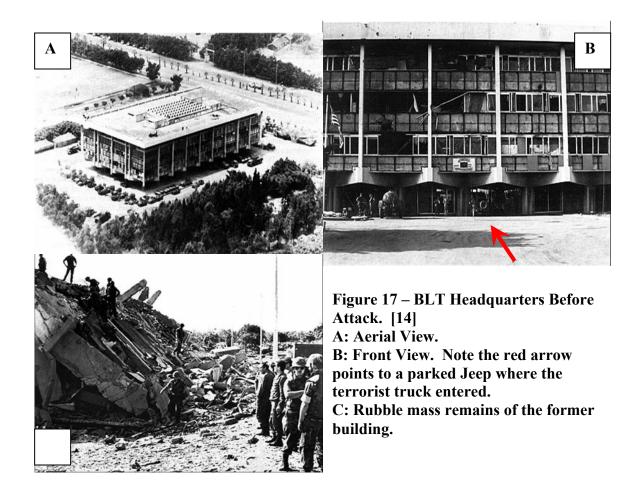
shows the headquarters building of the BLT before the attack and after the attack. The building is a four story reinforced concrete building located in the administrative area of the Beirut International Airport. The building had suffered fire and explosive attacks before the BLT occupied it. Most of the plate glass had been replaced with plywood, and the interior elevator was inoperable due to fire damage, otherwise the building was serviceable as their headquarters and as berthing. Entry to the building was by local roads, with the security perimeter extending 330 feet to the local roads.
